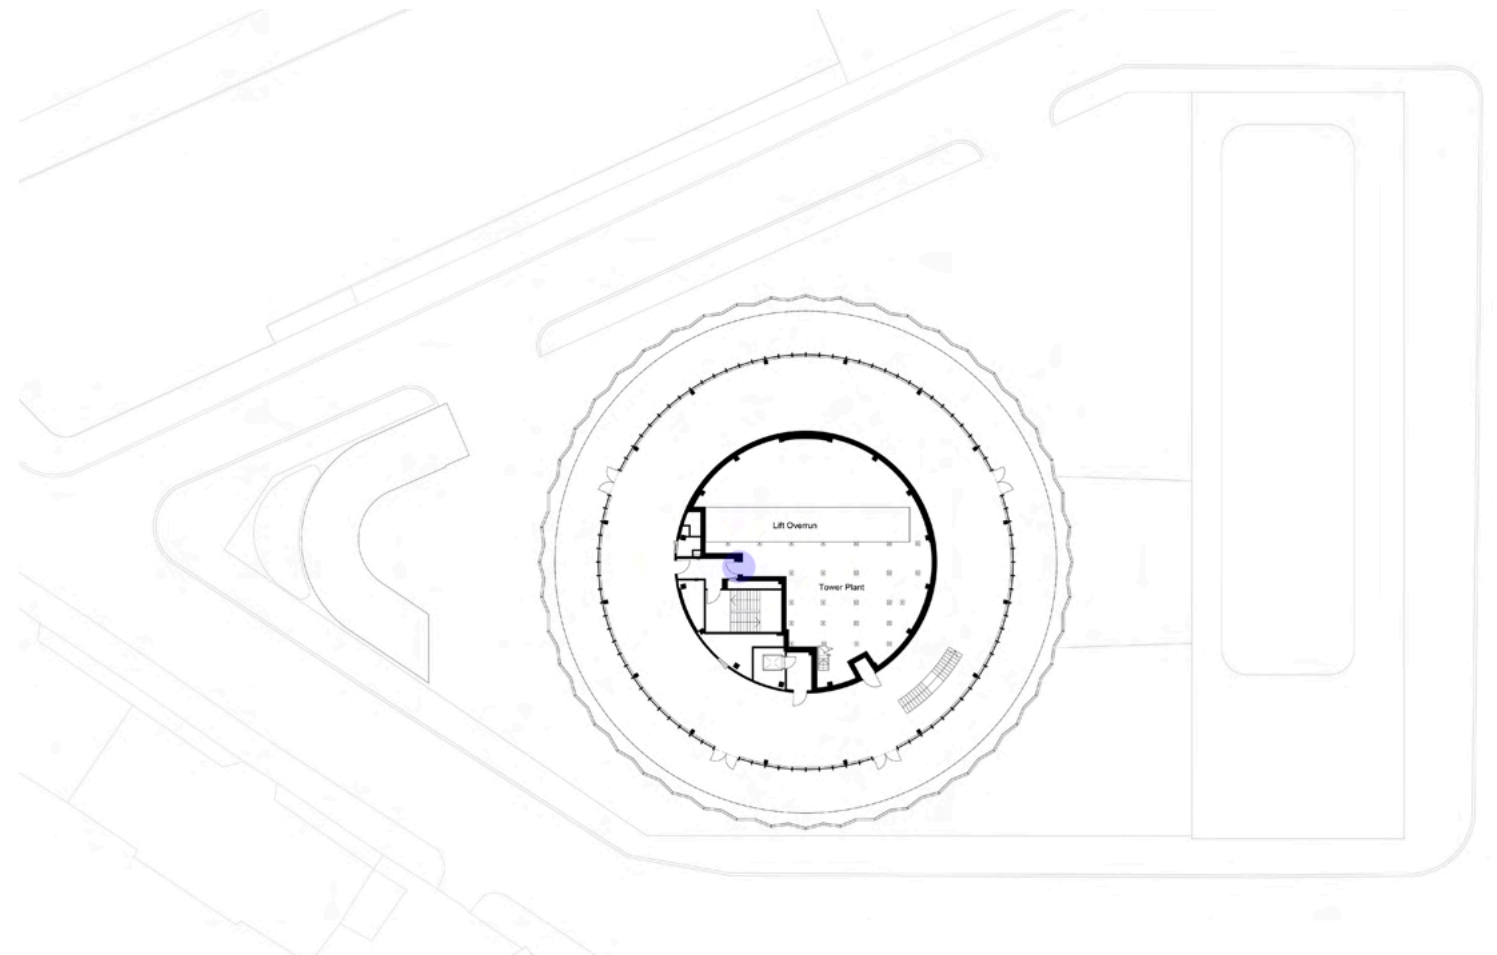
Level 17 Plan - MAT 07 location
